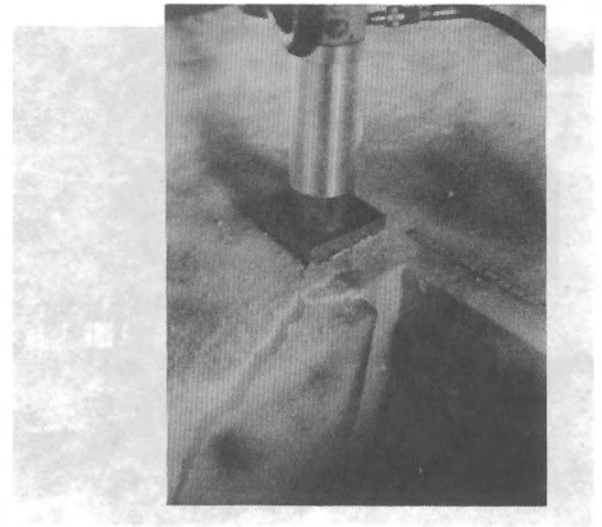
Model footing test conducted at DYE-3 under a crane which provided reaction for the hydraulic jack shown.
